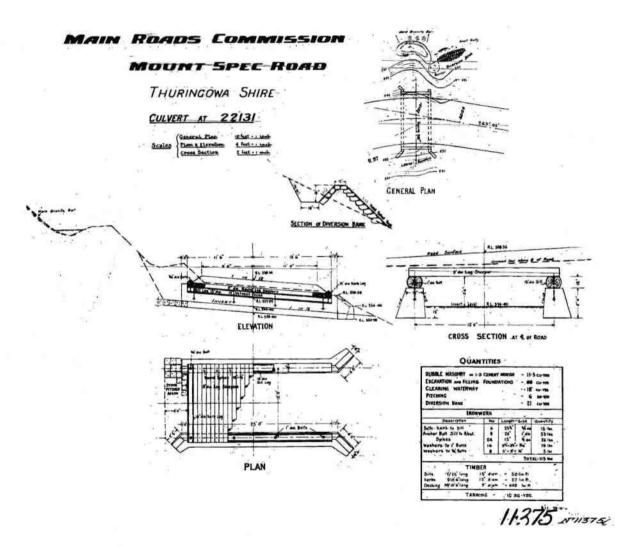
Original drawing no. 11375 of Culvert 187A (Fairy Falls) at 22,131' through chainage. The original timber decking was replaced with concrete decking in the 1960s. This is the only culvert on the road with a documented diversion bank above the inlet.
